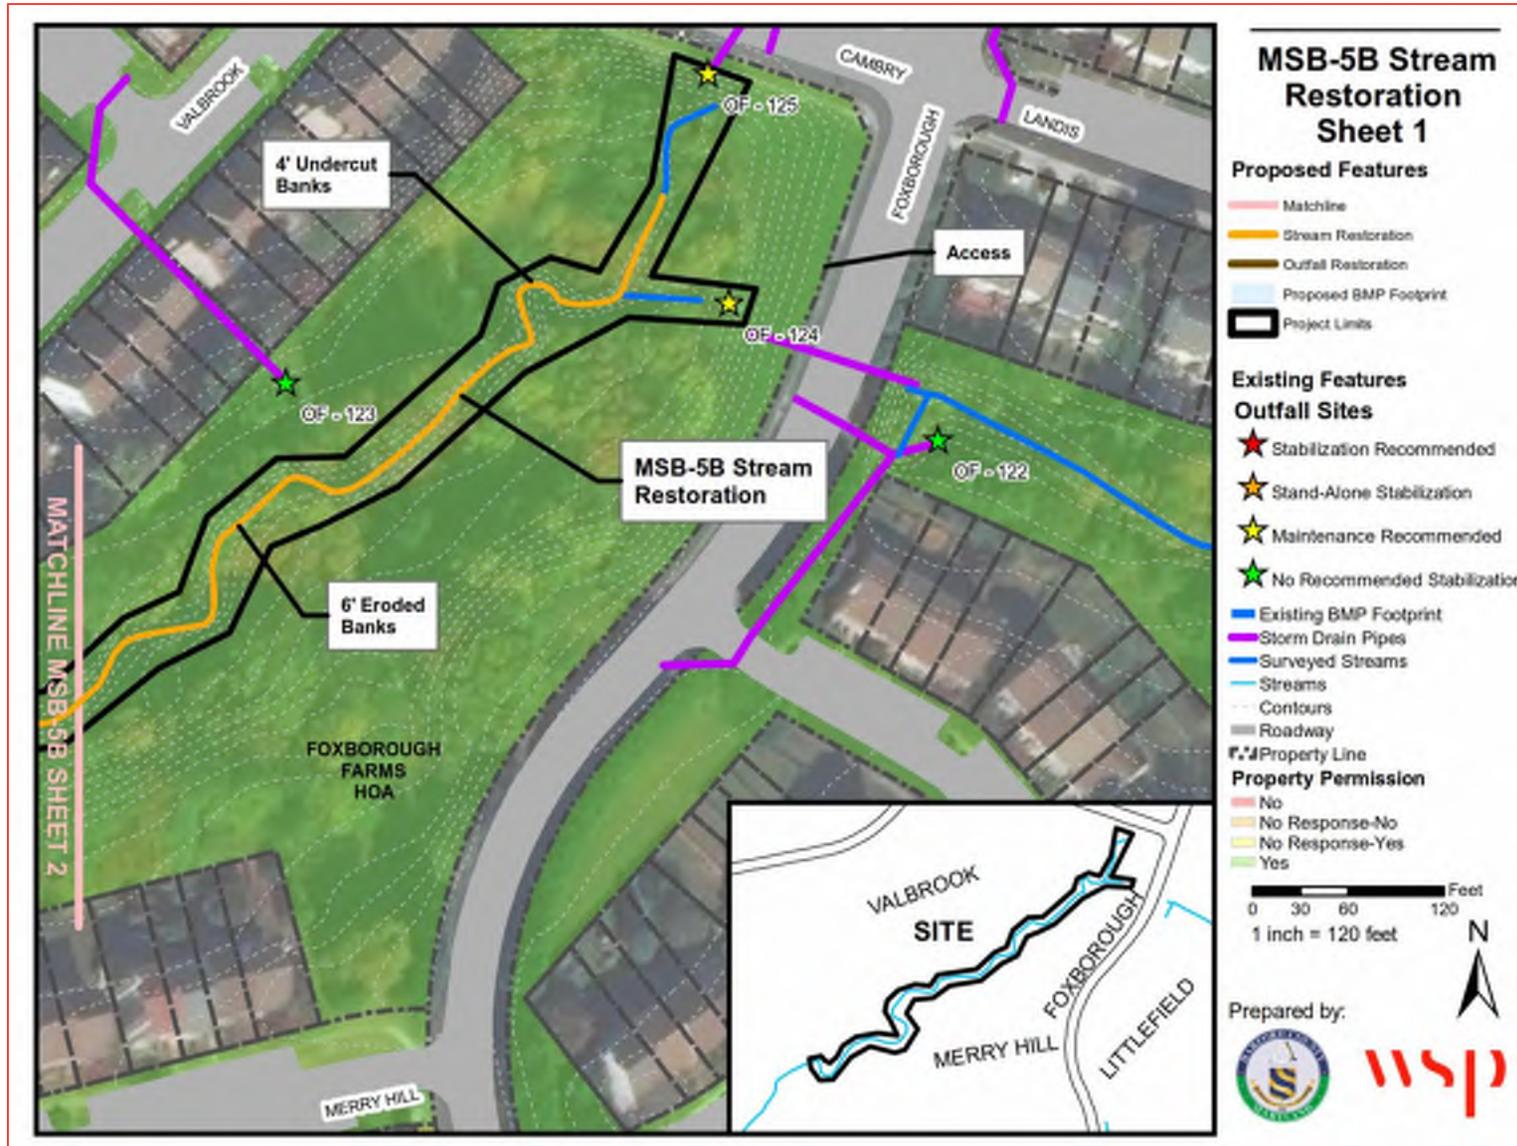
Site Location and Proposed Project Plan for MSB-5B Stream Restoration (Sheet 1 of 2)
